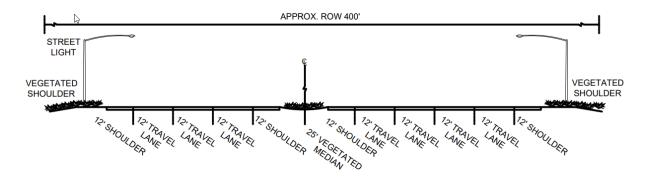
Seward Highway between Tudor Road and 36th Avenue
